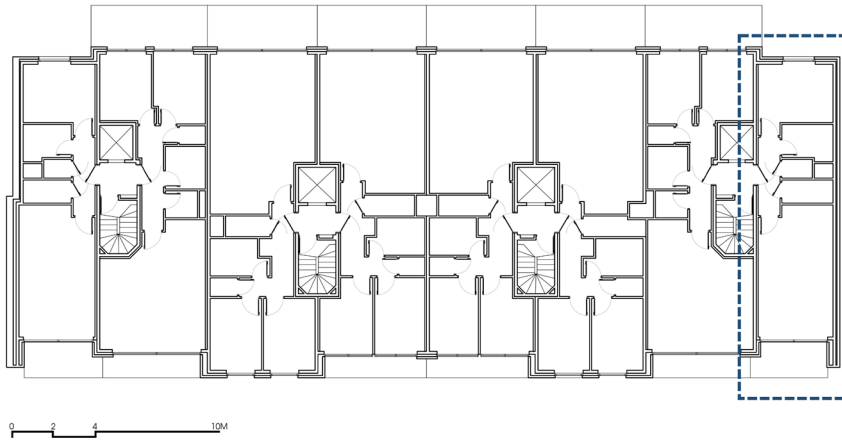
The layout of the building, split into four blocks. The fifth floor where Leo has one neighbor. Leo uses the elevator only.
